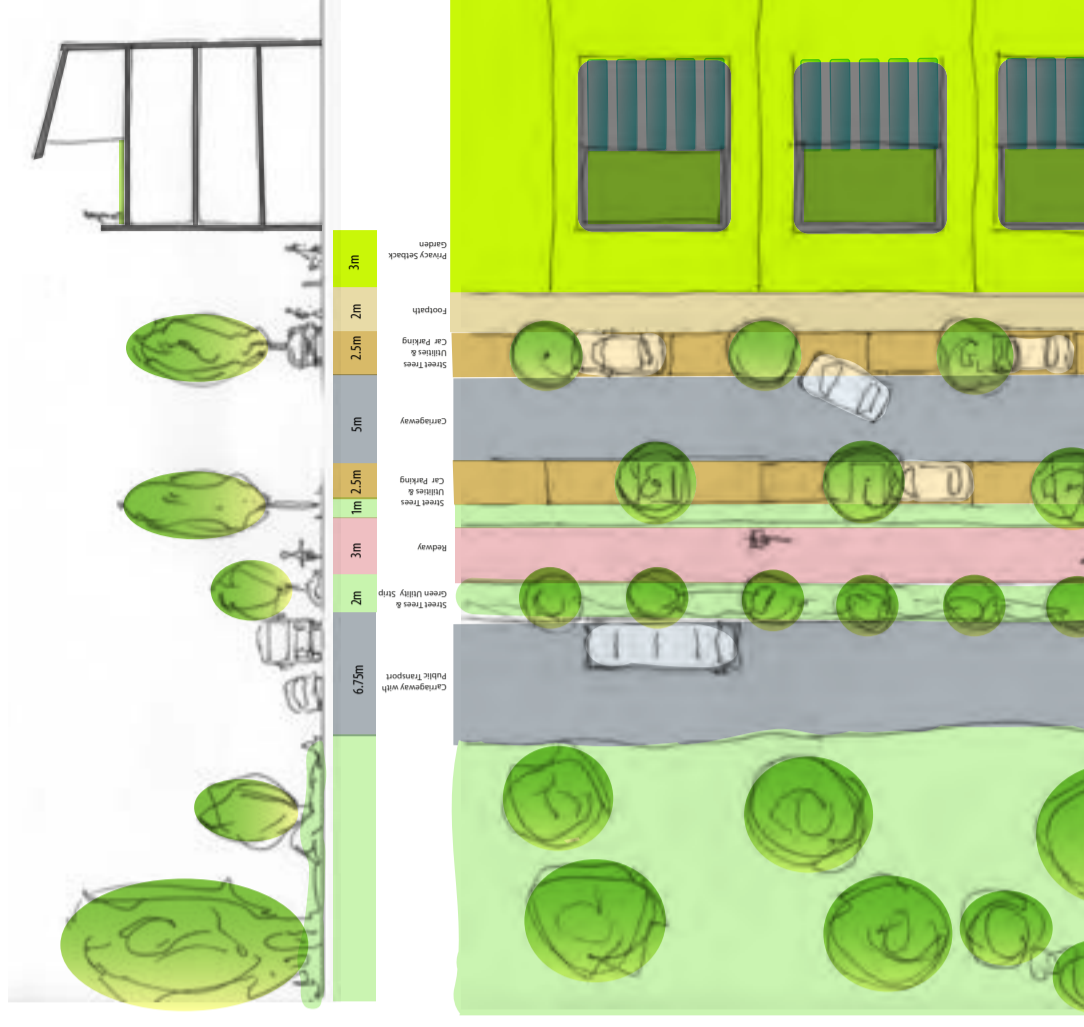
Illustrative Cross Section Bow Brickhill Relief Road (alternative interface with development)
